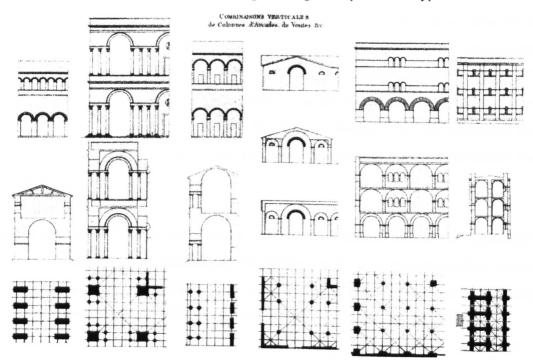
Examples of Durand's vocabulary of building plans and elevations (Durand, 1802-5)
